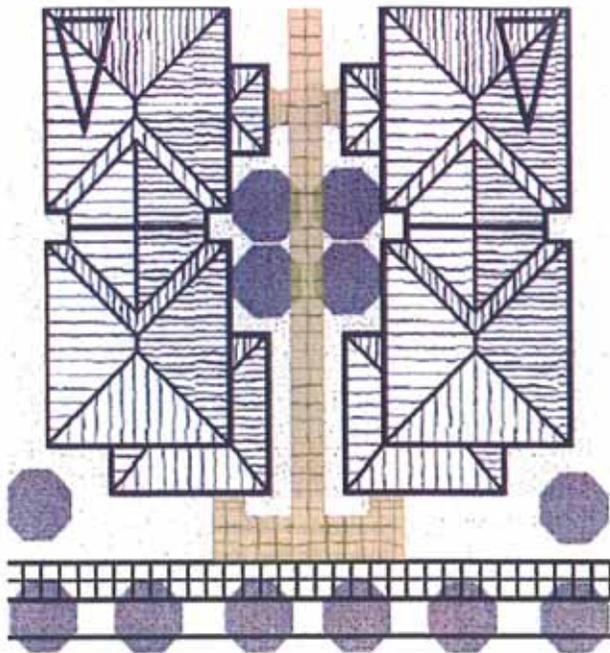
Entrances may face a common courtyard, provided there is a direct connection to the street.
